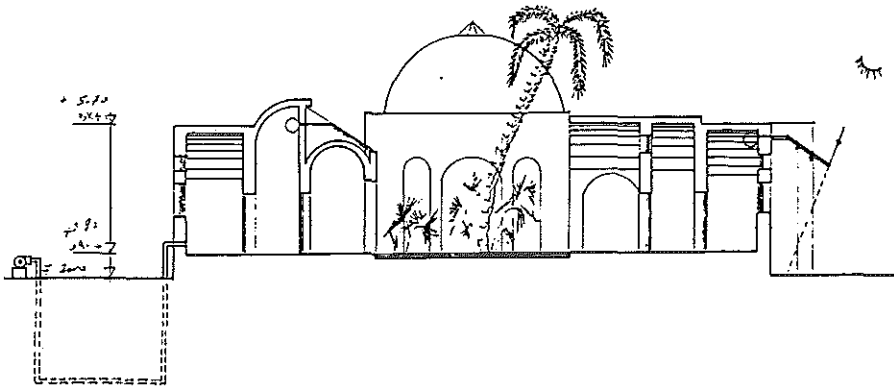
Section of the Guest House Building Shows the Earth Air Tunnel System
